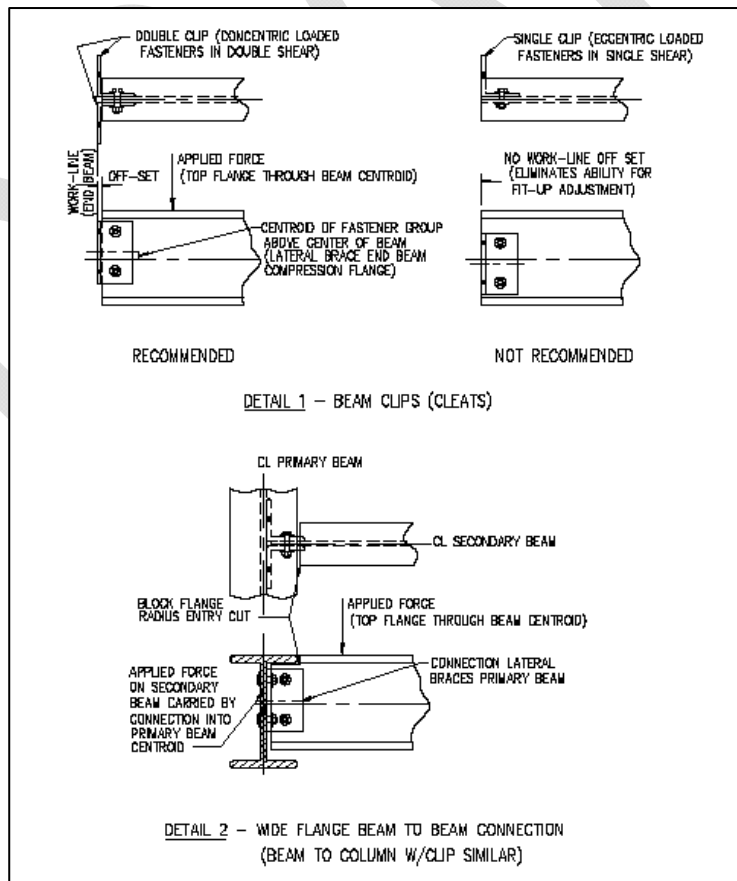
PULTRUDED FRP STRUCTURAL CONNECTIONS
